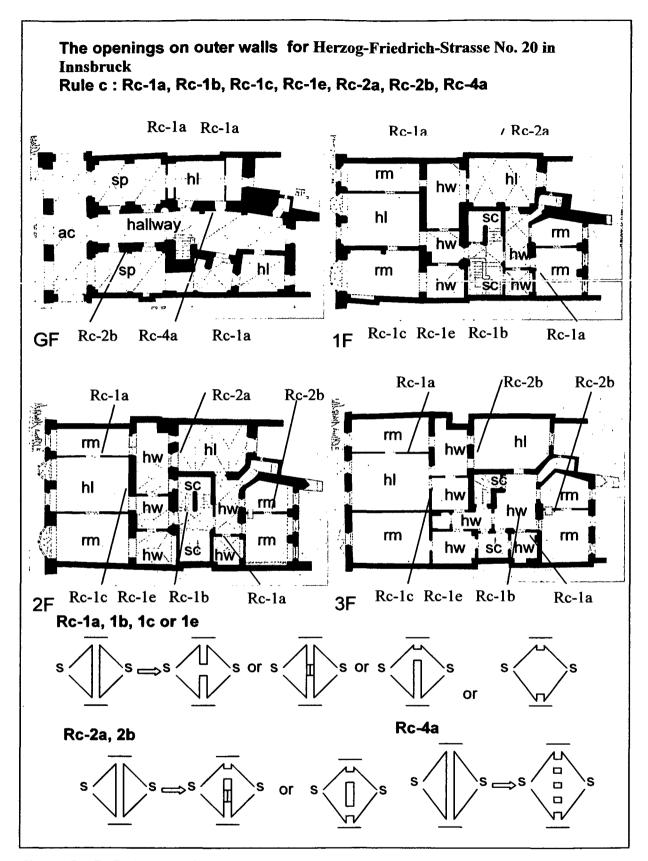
17 Rule C for floor plans at Herzog-Friedrich-Strasse No. 20 in Innsbruck
